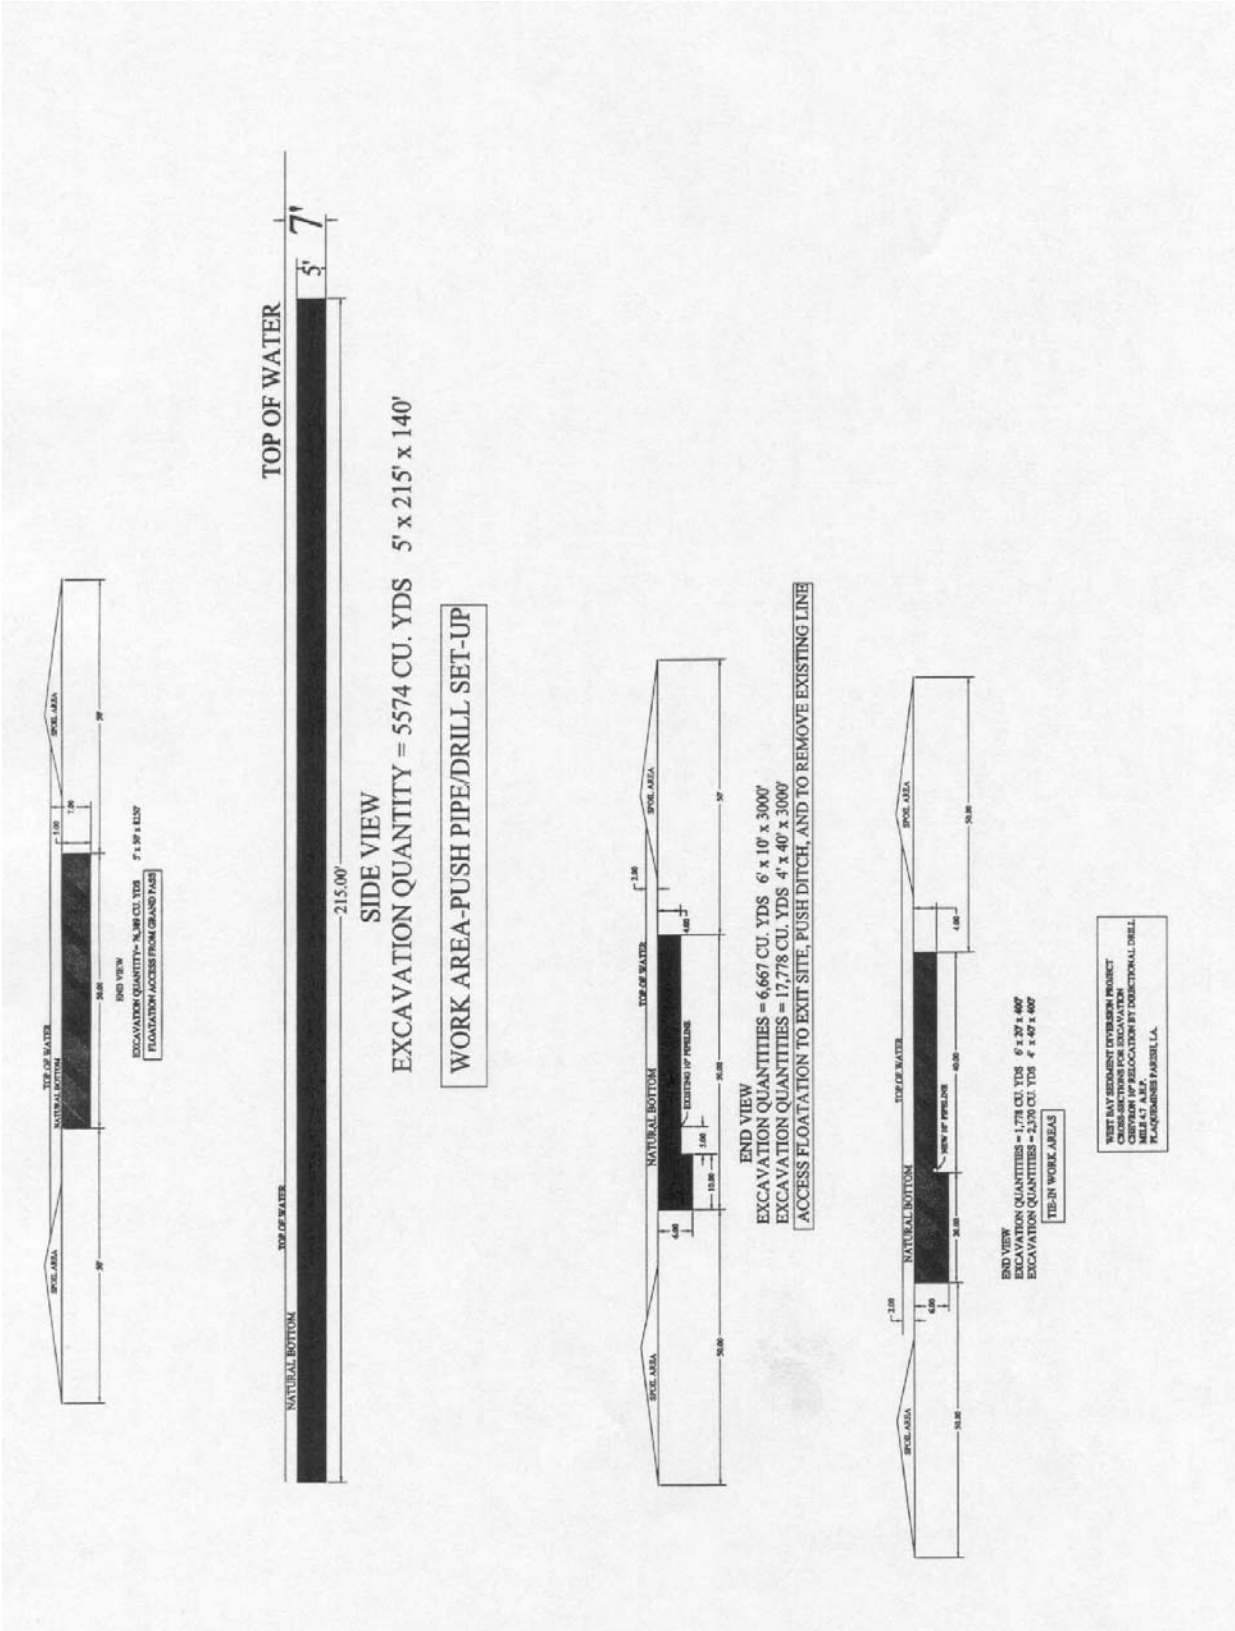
Pipeline Relocation Plans – Work Area-Push Pipe/Drill Set-Up.
